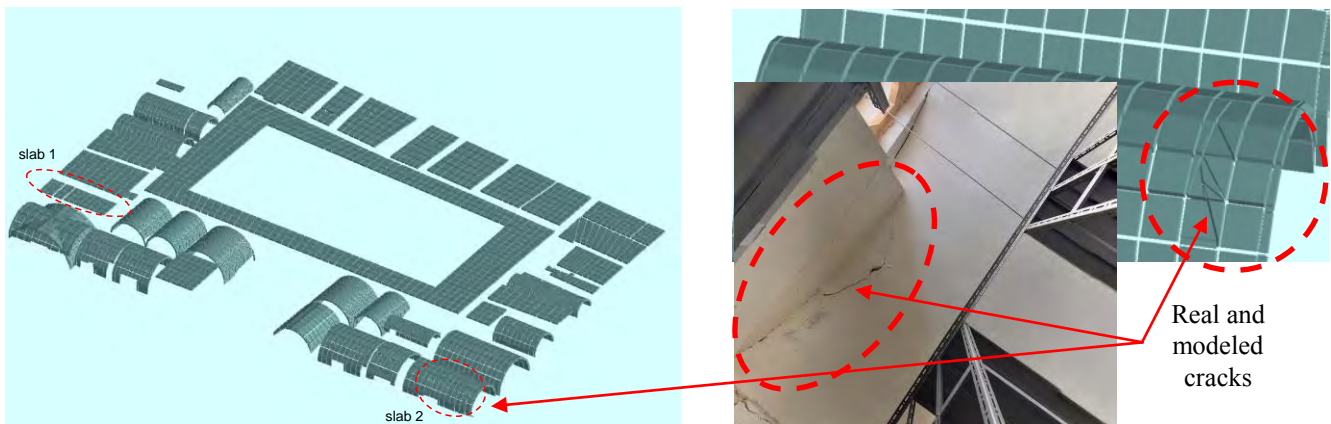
Sample for cracks and damage modeling in ground floor roof.
